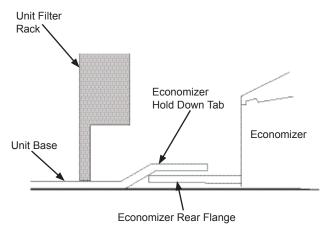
Rear Economizer Flange Installation (Small and Large Cabinet)
